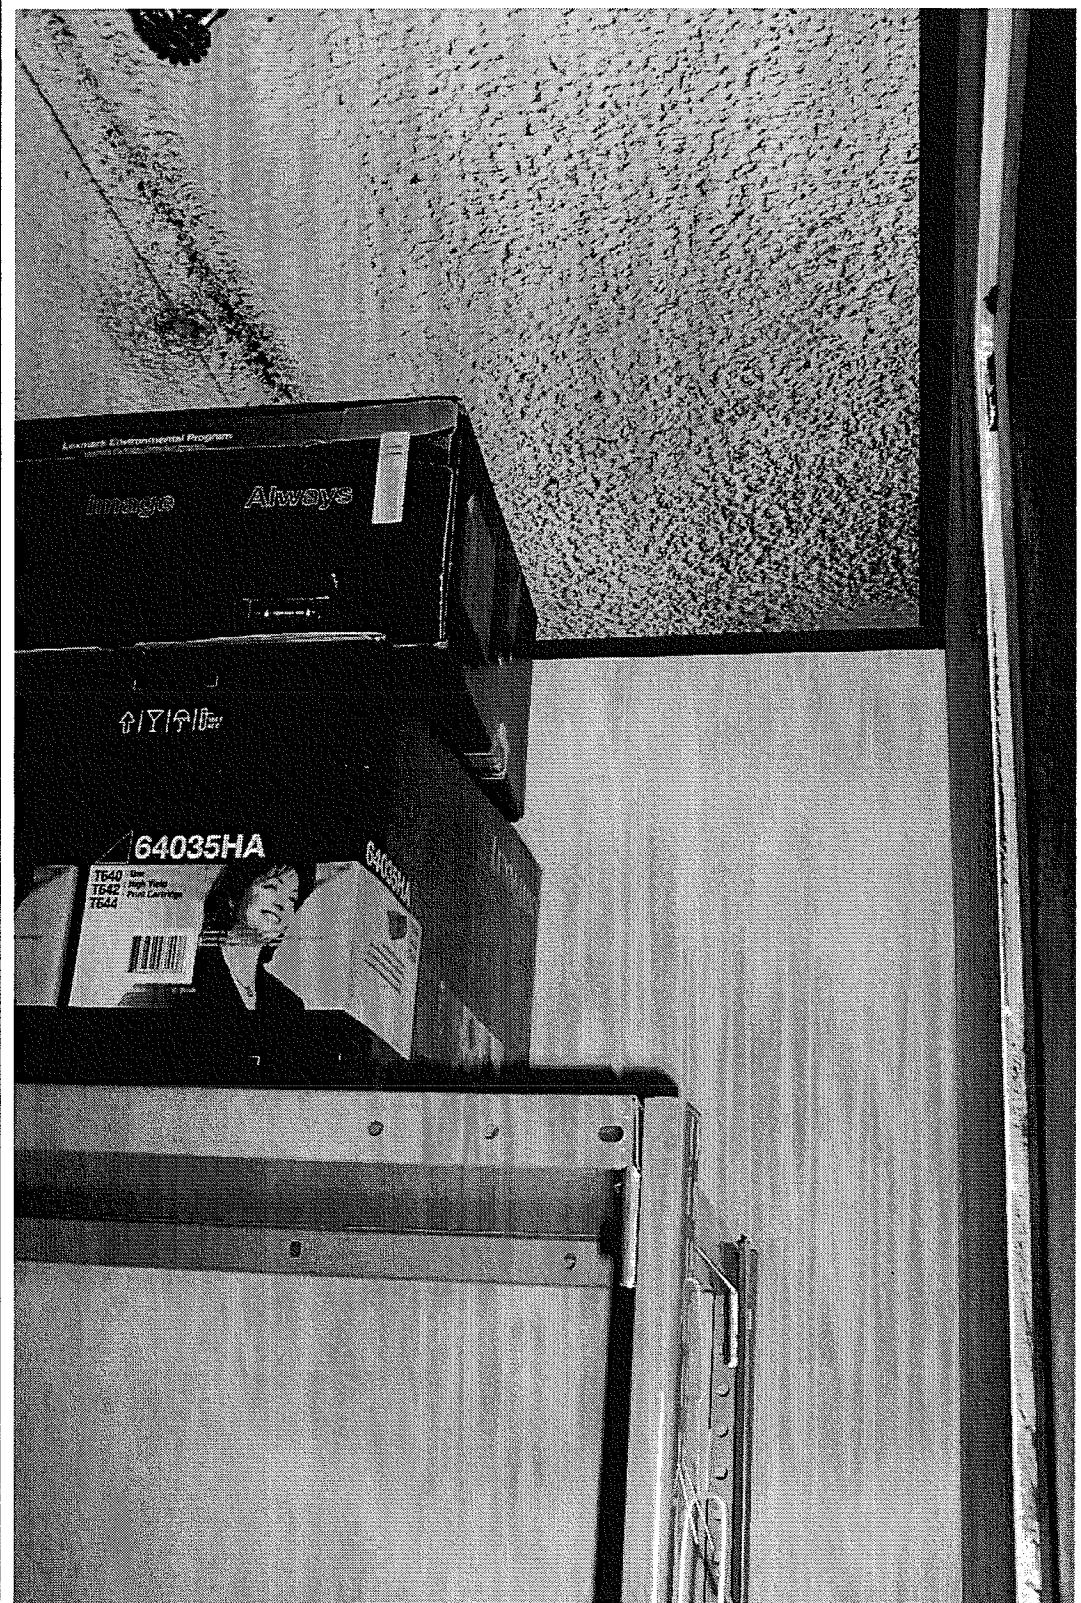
B Floor - Purchasing B7/B5 - View of acoustical plaster in storage room
